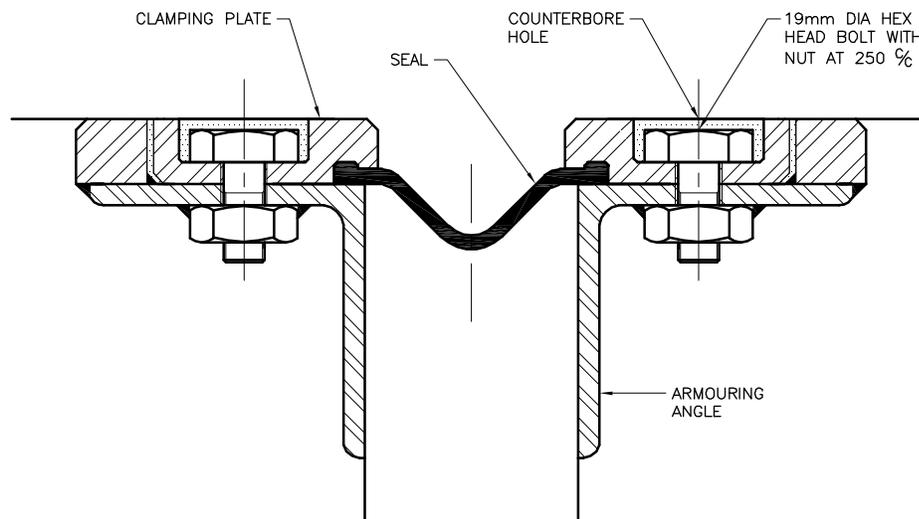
Strip Seals – Type A Steel Plate Clamping Device
